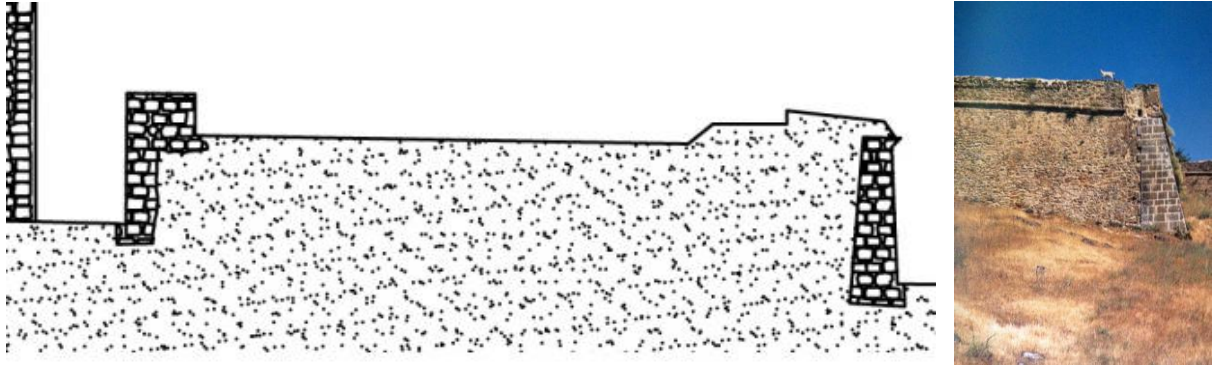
30- Section scheme of a masonry earth wall, Figure 3. 31- Picture of retaining wall in Alentejo region.
